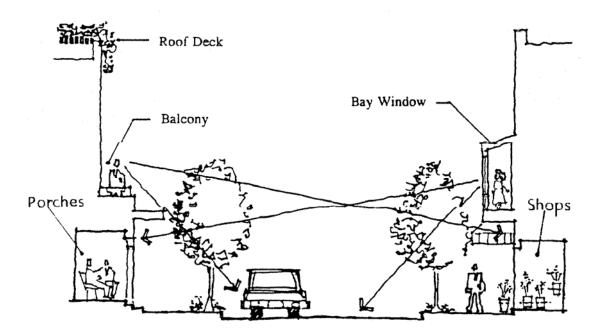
Site planning and building design can promote "eyes on the street" and safety.
